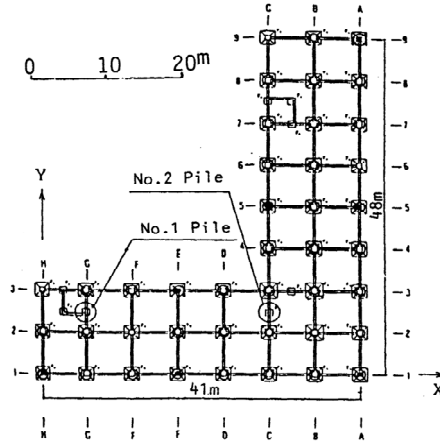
Footing and foundation beams of Niigata Family Court House (from Hamada, 1992)
